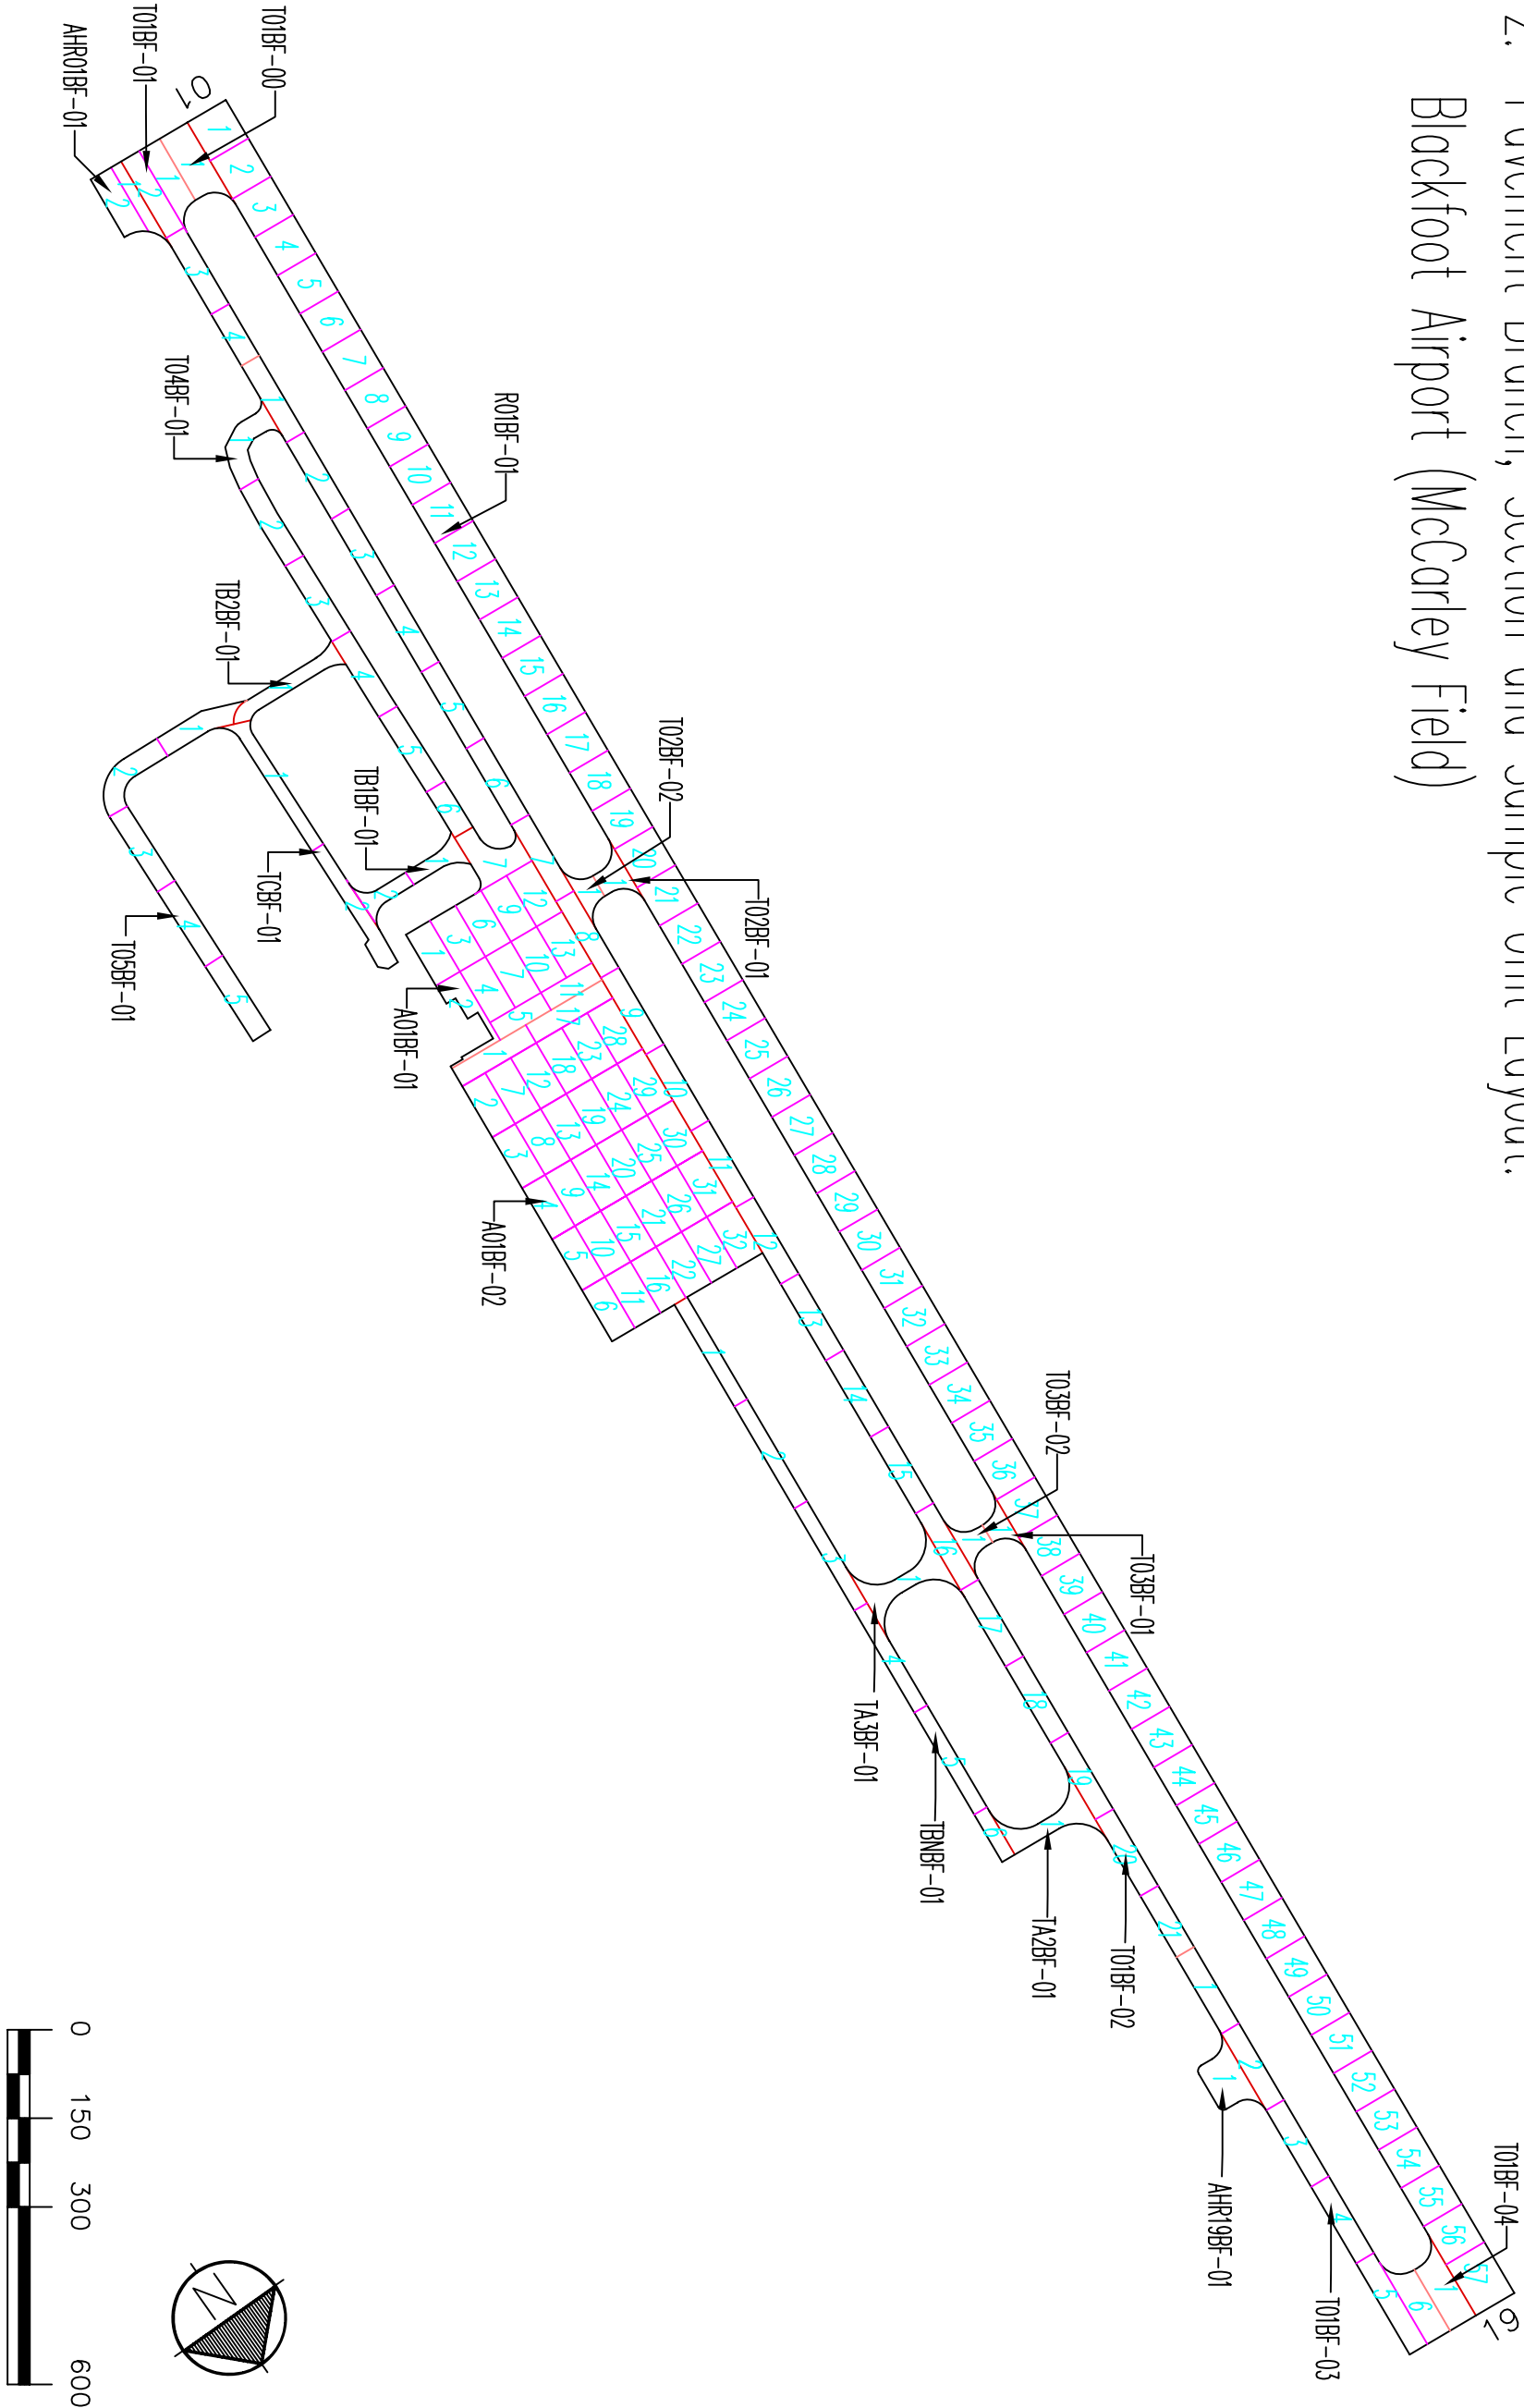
Pavement Branch, Section and Sample Unit Layout.
